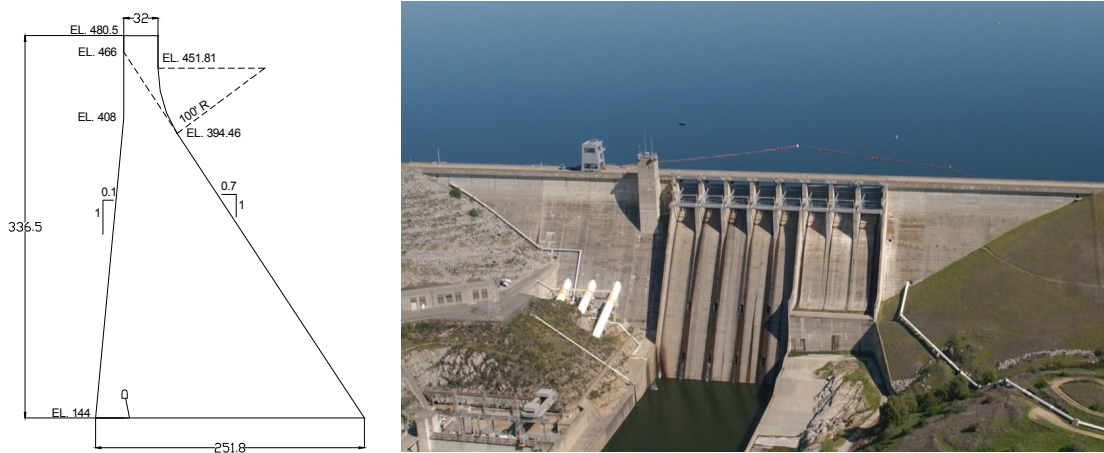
Example Dam and geometry of tallest non-overflow section.
